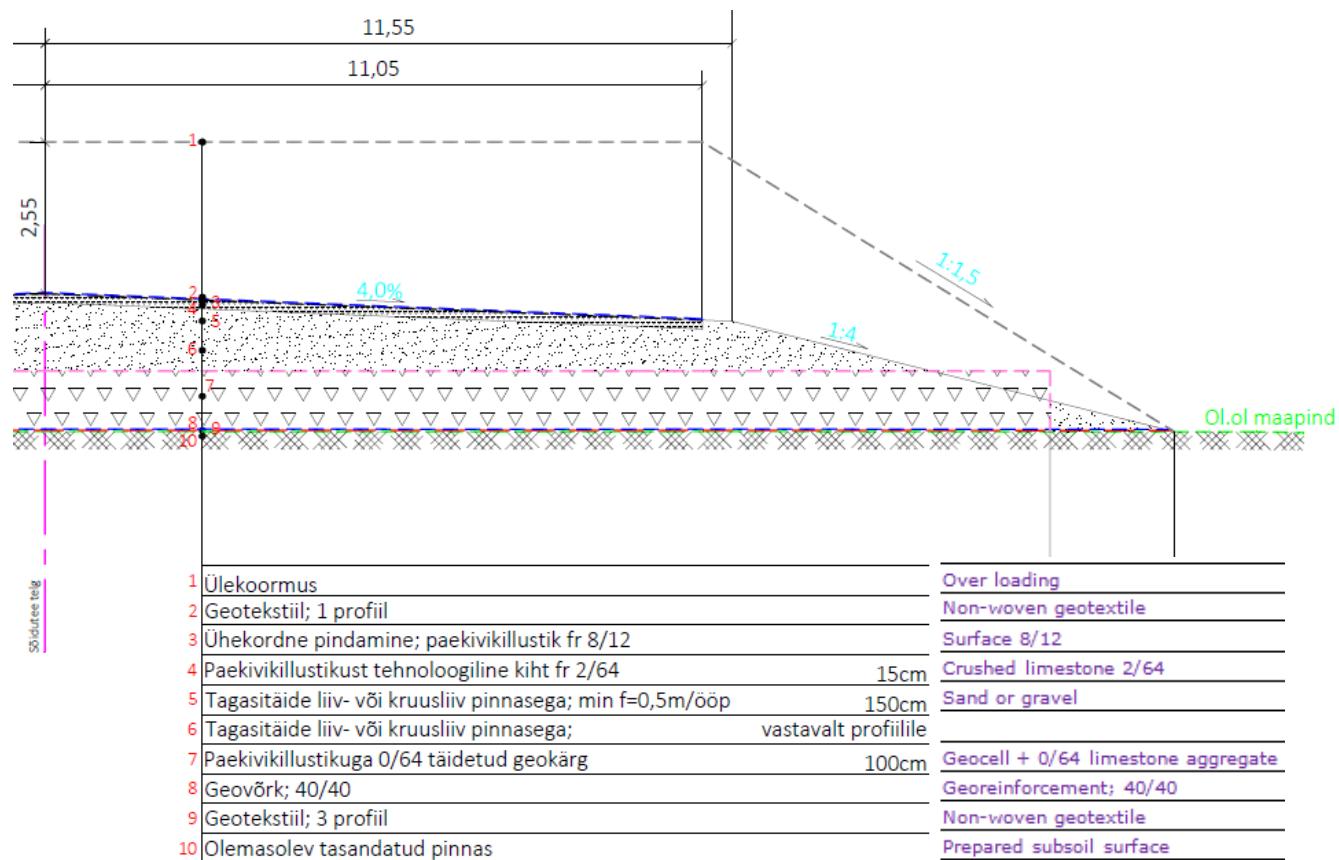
Cross-section of test section 3. Geocell-structure (1m) on top of georeinforcement.
